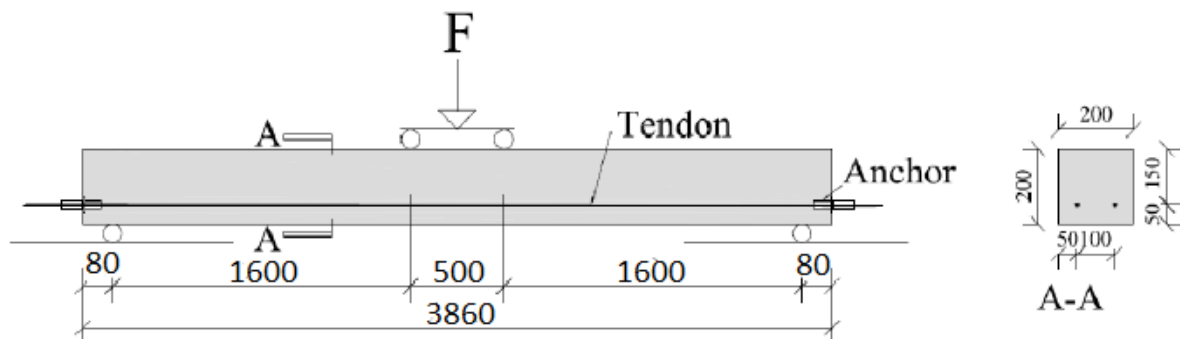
Schematic drawings of bending test setup and beam cross section
